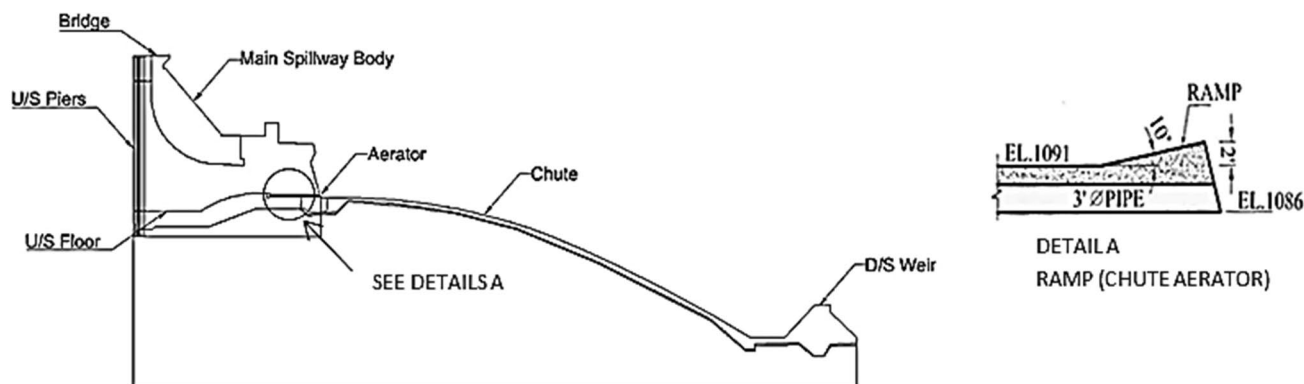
Longitudinal section of Mangla Dam Spillway up to first stilling basin
